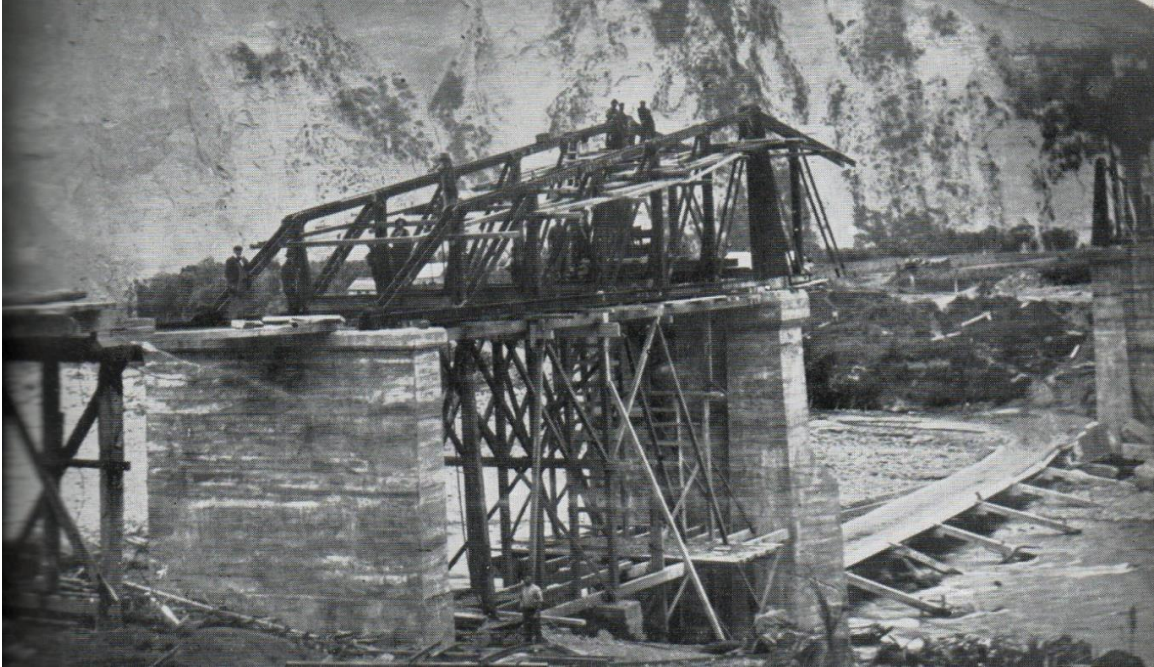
Cantilever bridge under construction in 1904. Note 1897 abutments being used as footing for scaffold
